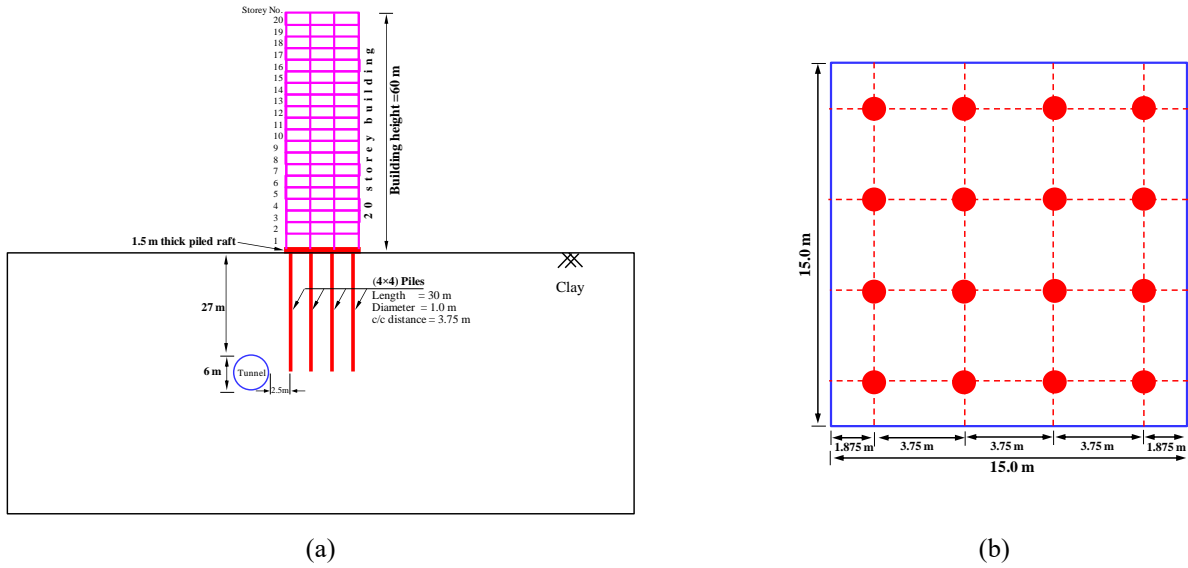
(a) General setup of building, piled raft and tunnel for a typical case T (b) Piles arrangement in raft
